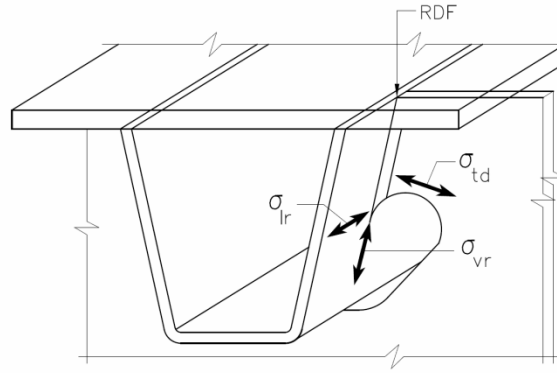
Common Cracking that May Occur at the Cut-out when Bulkhead is Used.
